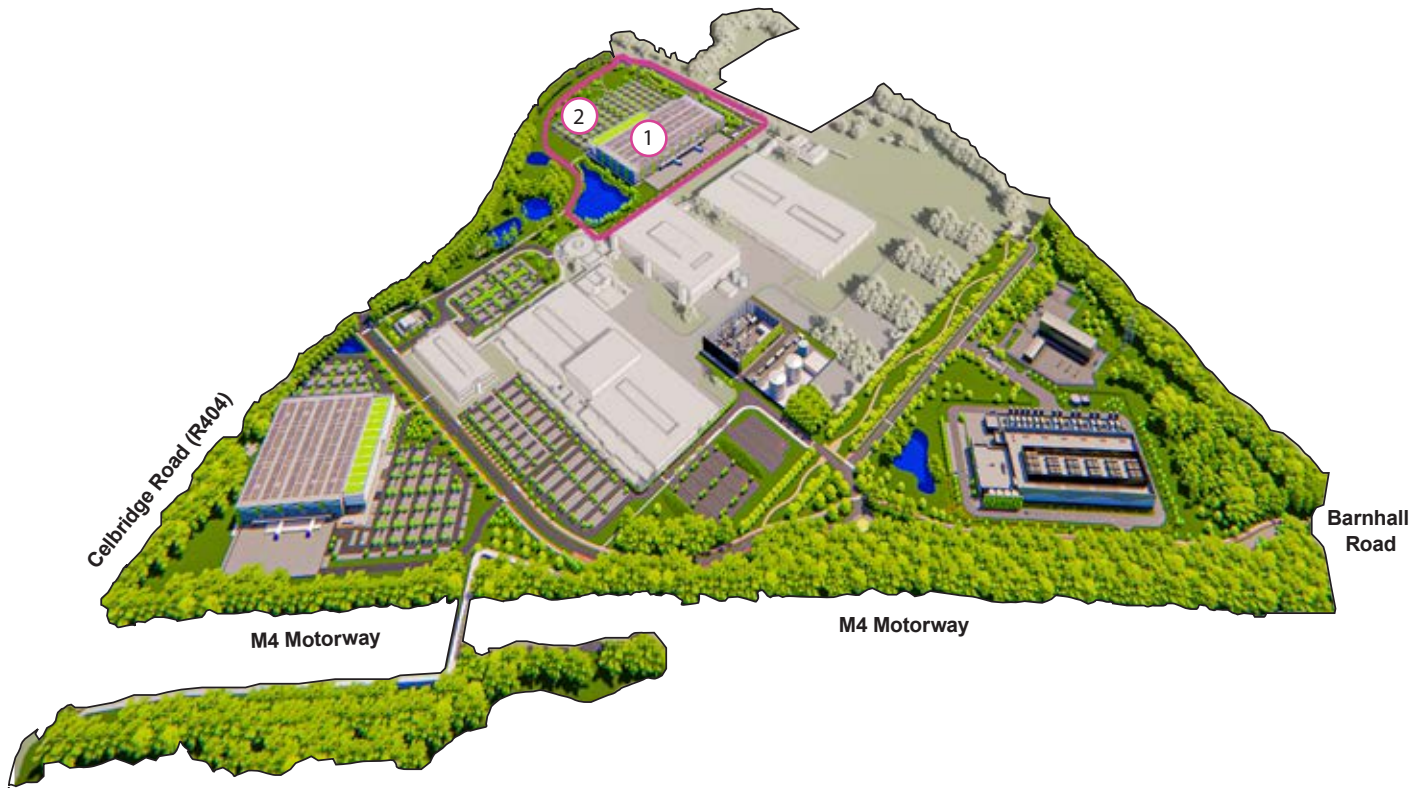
Kildare Innovation Campus Phase 2 Plan (Purple Outline). Source: RKD Architectural Design Statement
